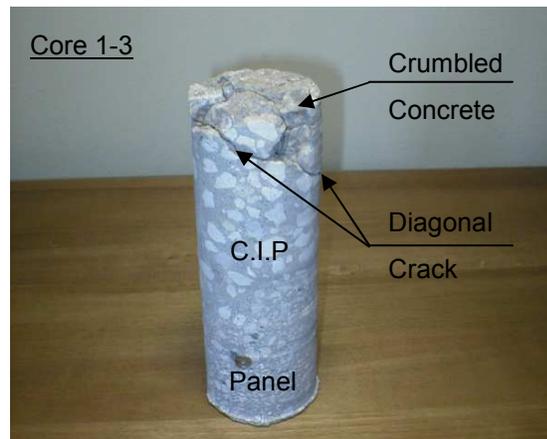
Crumbled concrete in top of a diagonal crack. (Core 1-3)
